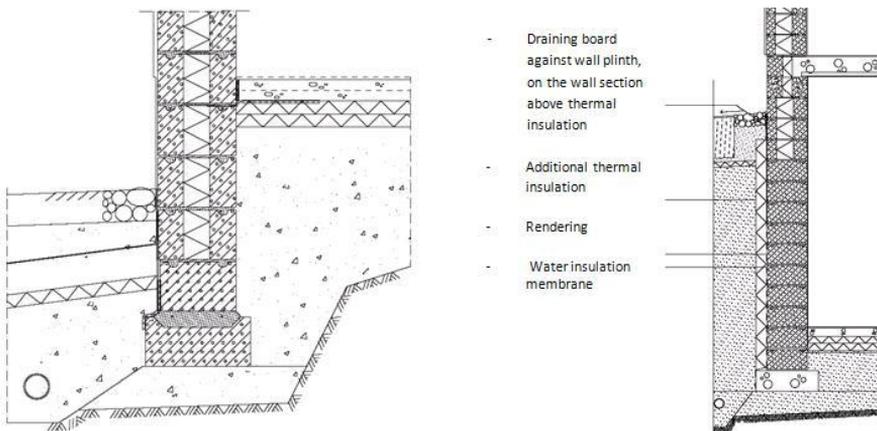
Additional thermal insulation for frost improves thermal insulation of bottom floor slab.
